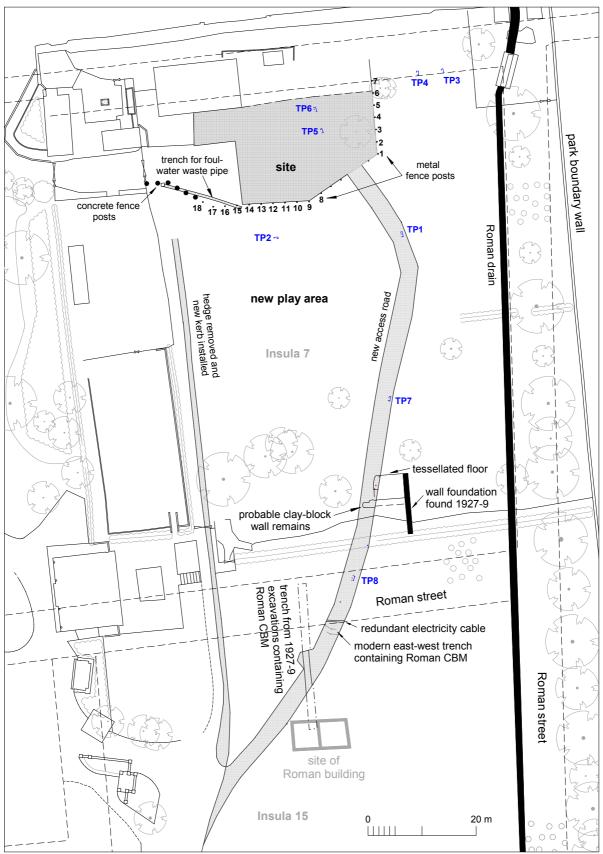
Site location plan. (Areas affected by groundworks toned grey.)
